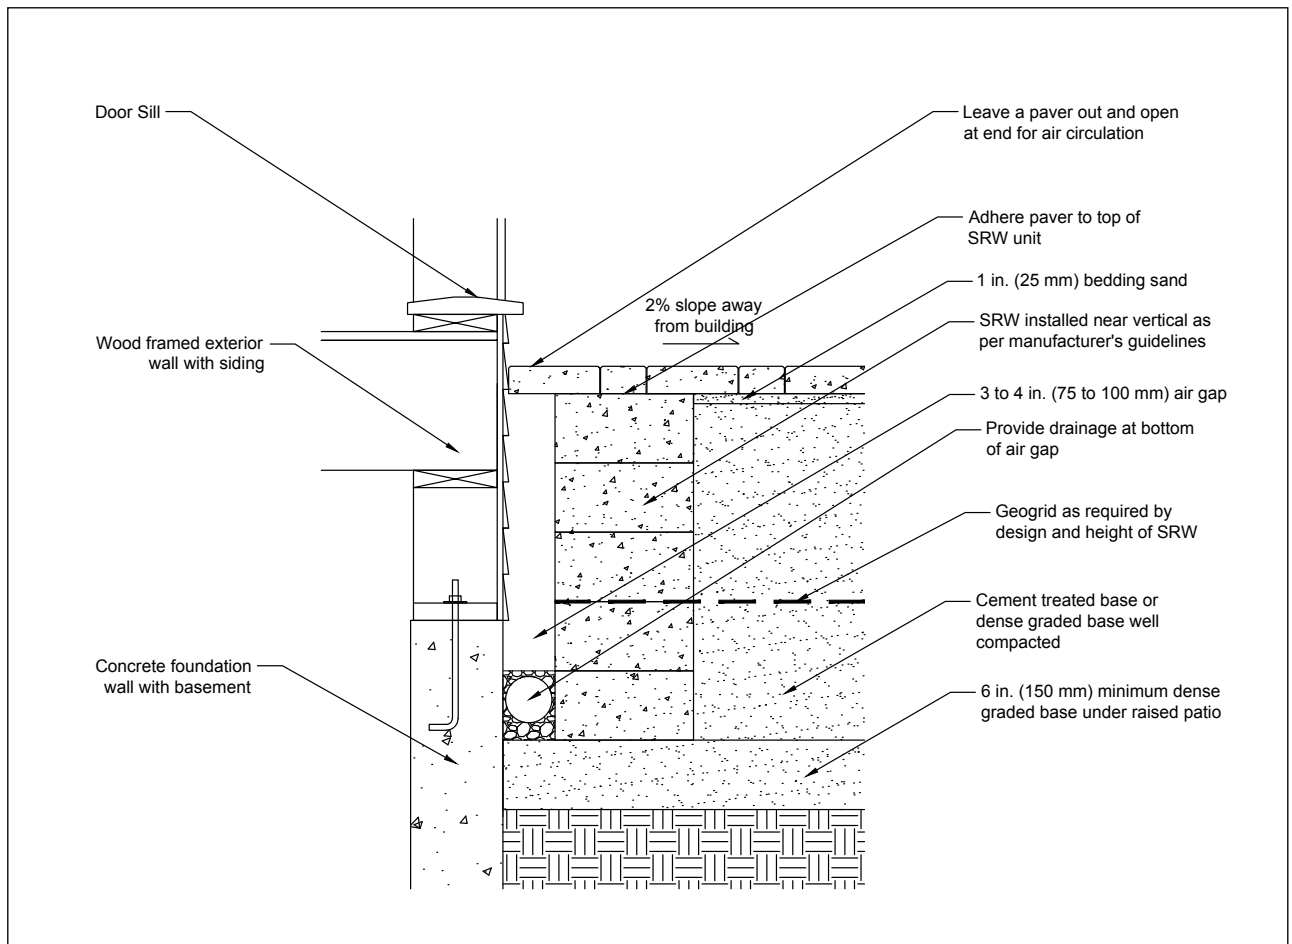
A stress relief wall is design to keep lateral soil pressure off an exterior wall.
